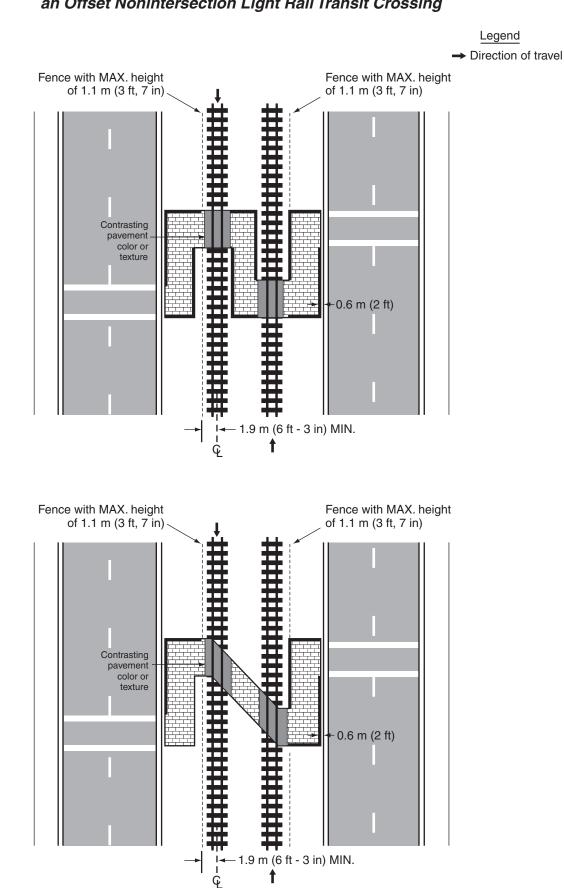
D-8. Examples of Pedestrian Barrier Installation at an Offset Nonintersection Light Rail Transit Crossing
